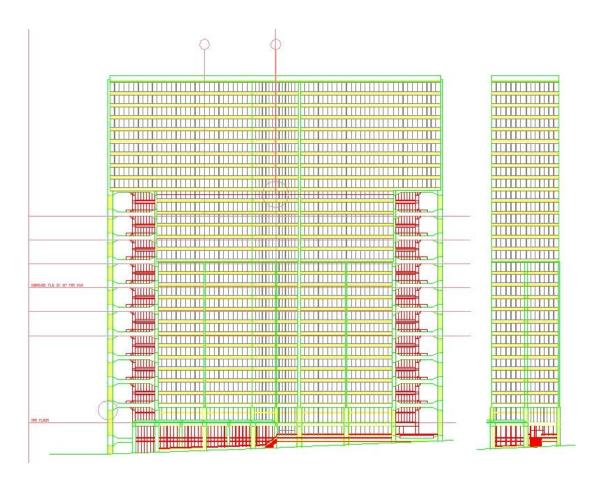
First example of an Elevation - high rise building. (Courtesy of Packer Engineering)
